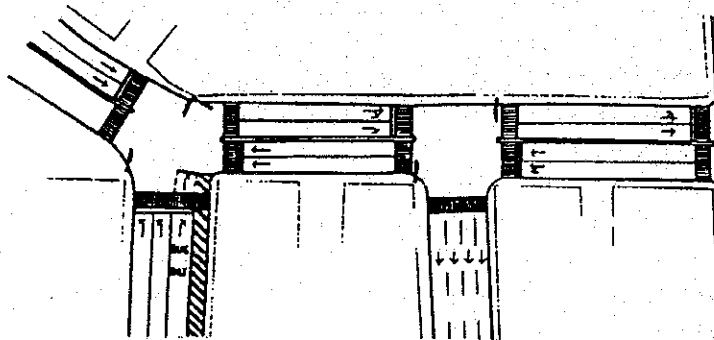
Concept of Improvement Plan on Puduraya Roundabout
